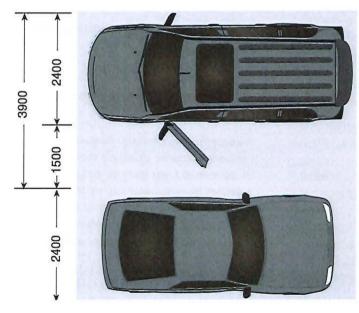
B Shared access aisle The access aisle may serve more than one parking stall and should have the same level surface as the parking stalls it serves. Consider the movement around doors and ramps so that there is enough space and it is not necessary to travel behind other cars or be in a position where it is difficult to be seen by other drivers. Figure 3.8.2.5. shows a shared aisle serving two stalls. The CSA B651, Accessible Design for the Built Environment standard is another source of information for accessible parking stall quantities and design.
